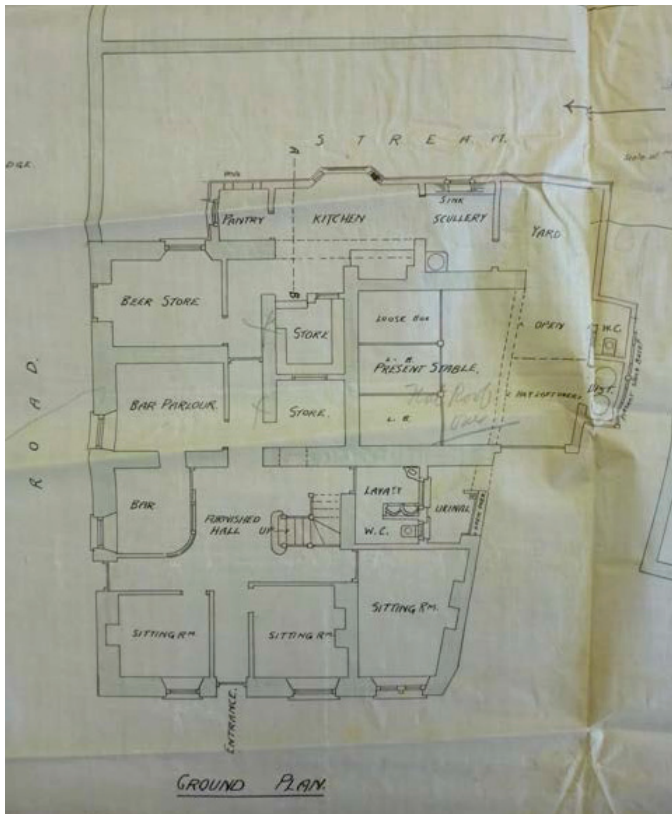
(left): Proposed ground floor plan (CAC(B) BSRDNL/2/583 1909)
